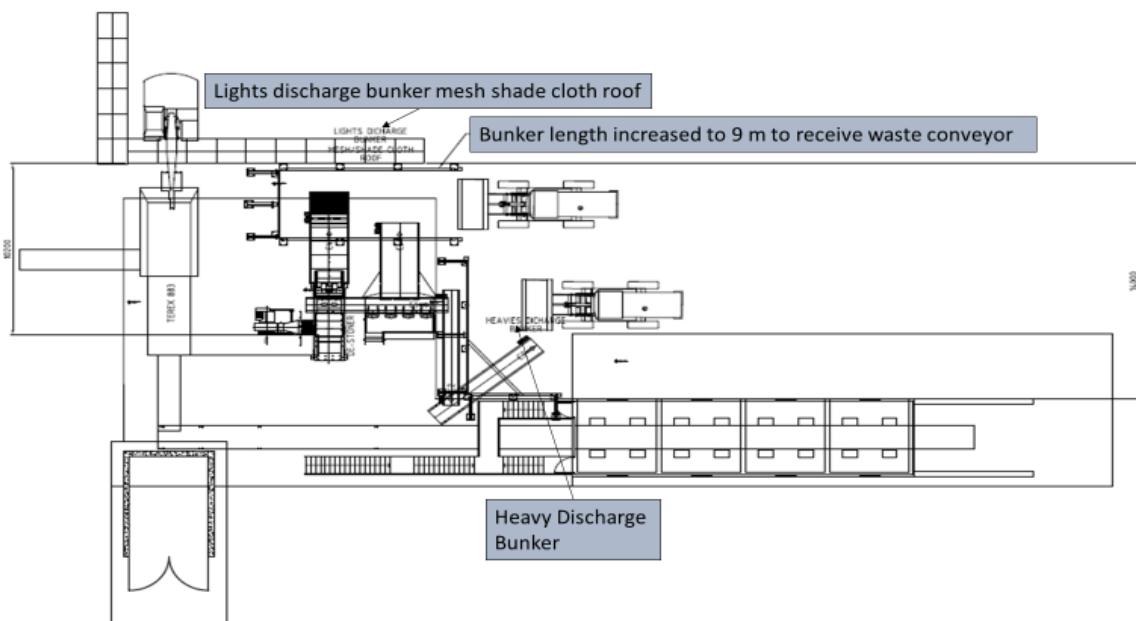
| Destoner and Conveyor Indoor Processing Plant (located within the shed)
